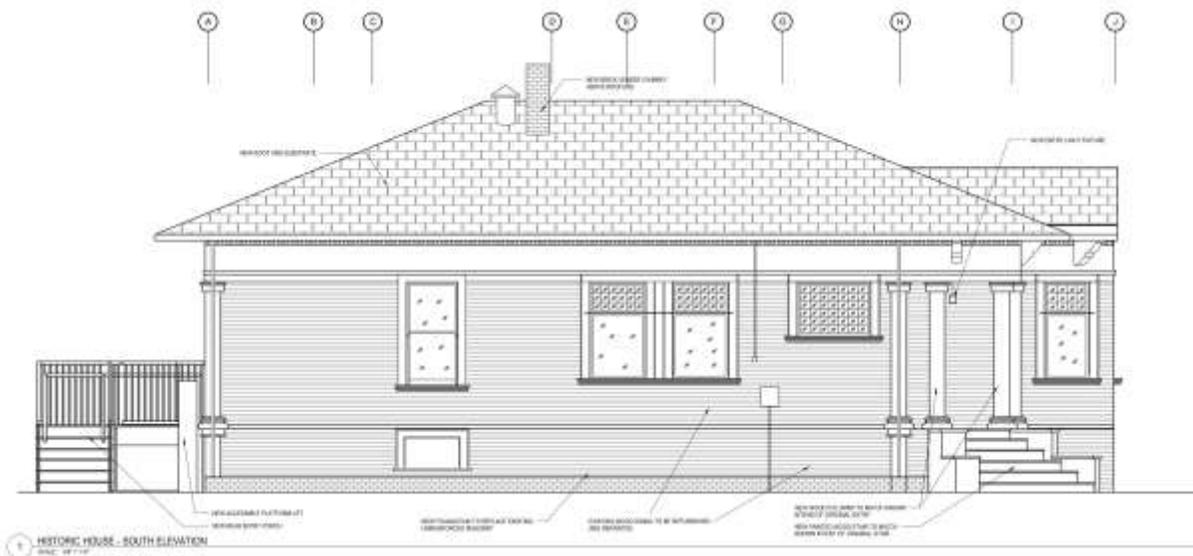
South Elevation facing North Mathilda Avenue showing restored porch
